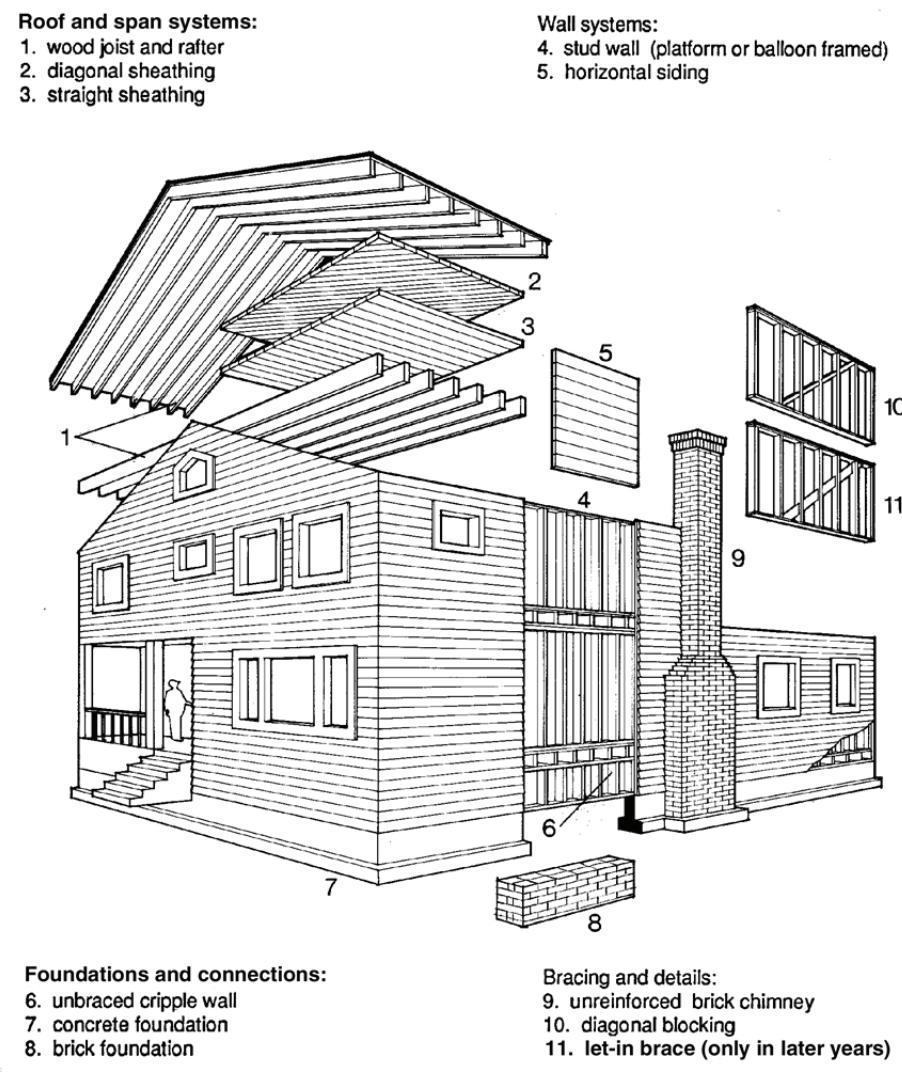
Drawing of wood stud frame construction (courtesy of Lagorio, Friedman, and Wong, 1986).
